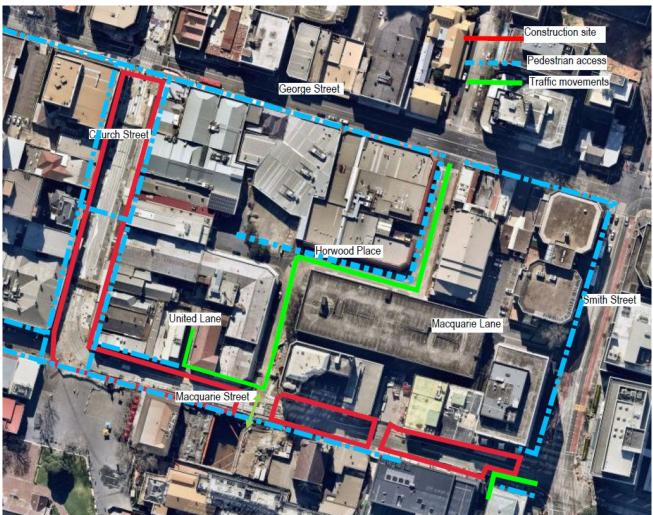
Parramatta Light Rail traffic arrangements mid-September 2021
